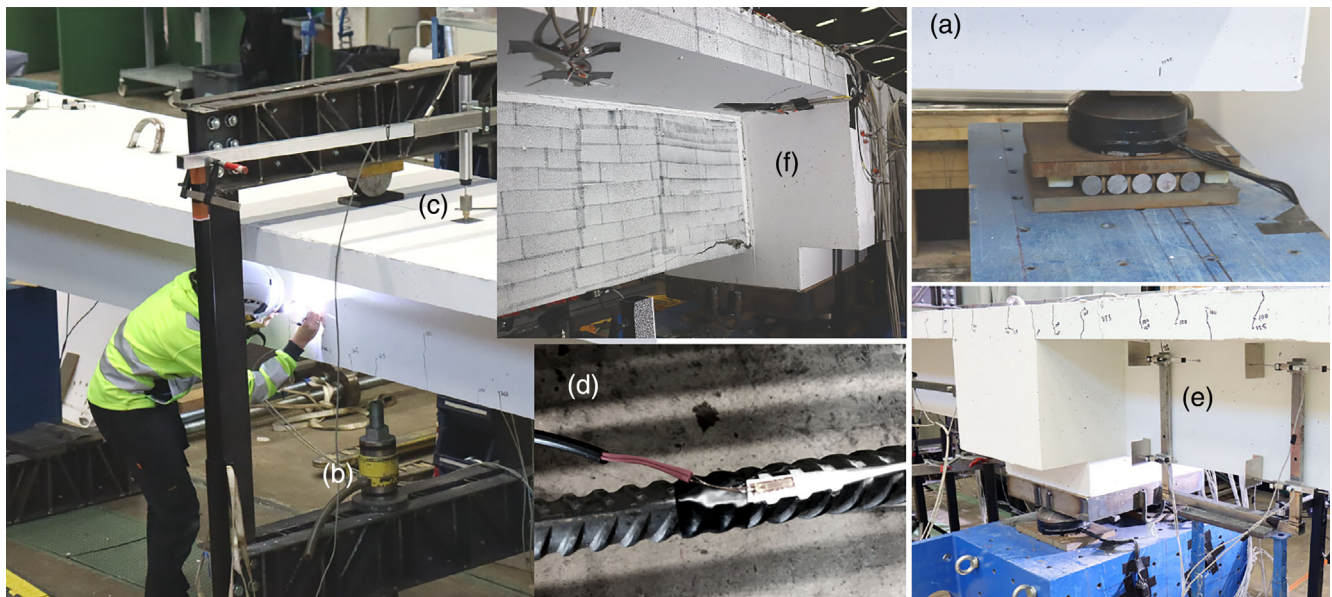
Instrumentation of a continuous precast prestressed test girder.
